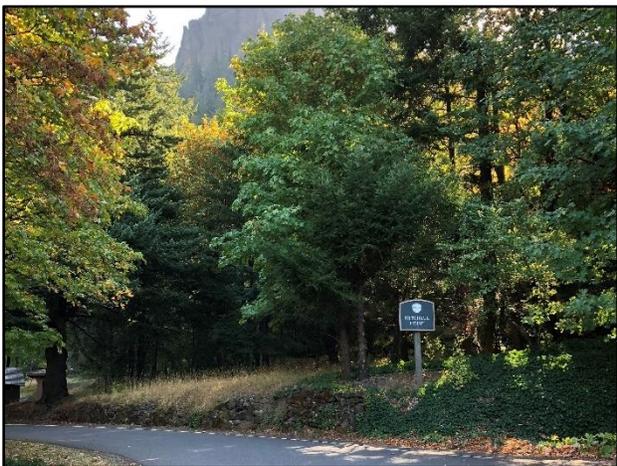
Dry stacked retaining wall on the southern edge of the HCRH at Site 35HR134 (view southeast).
